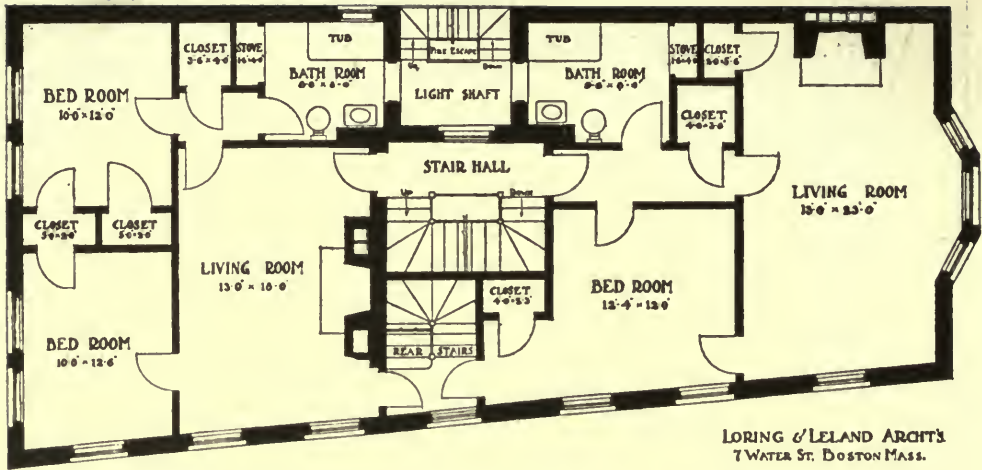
FLOOR PLAN—"THE RIVER STREET APARTMENTS."
